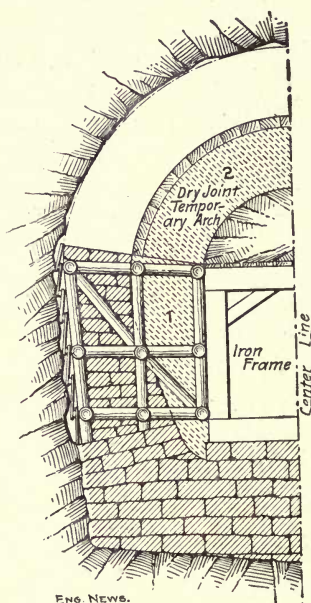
Suggested Method for Building Roof Arch Through Soft Rock.
